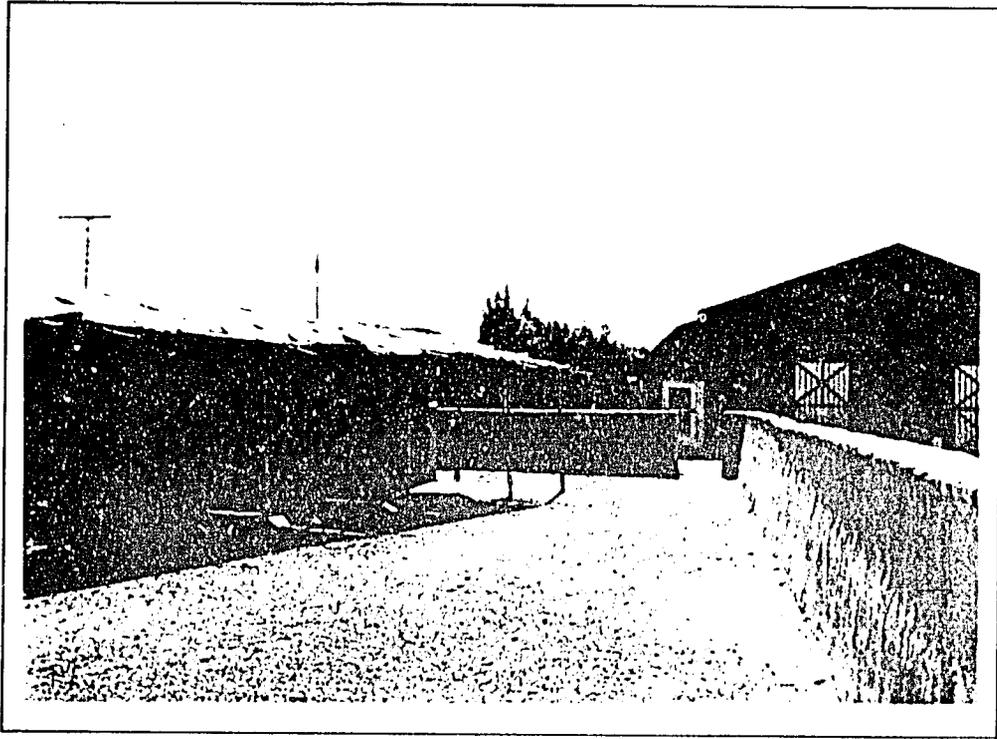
Quetta RONCO Office Facility. Warehouse facility facing east.
